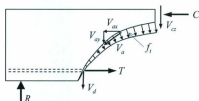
Internal forces in a cracked beam without stirrups
